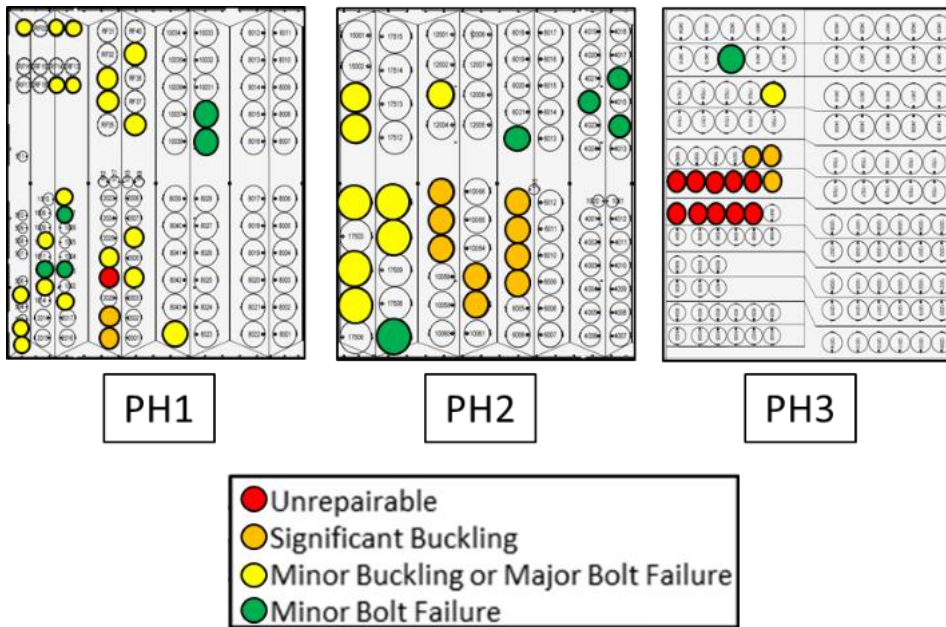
Winery layout and severity of damage to the tanks (Courtesy of Structex)
